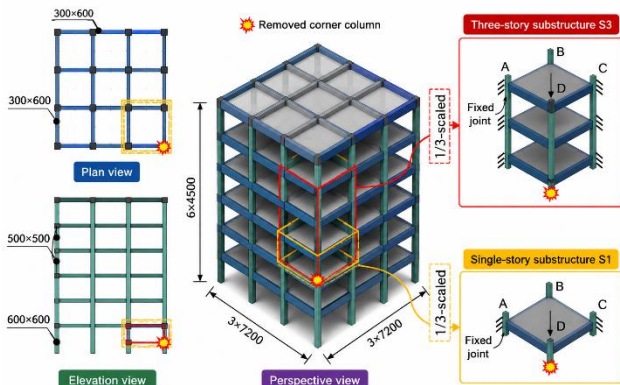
Geometric layout and reinforcement details of the six-storey prototype RC frame (dimensions in mm).
